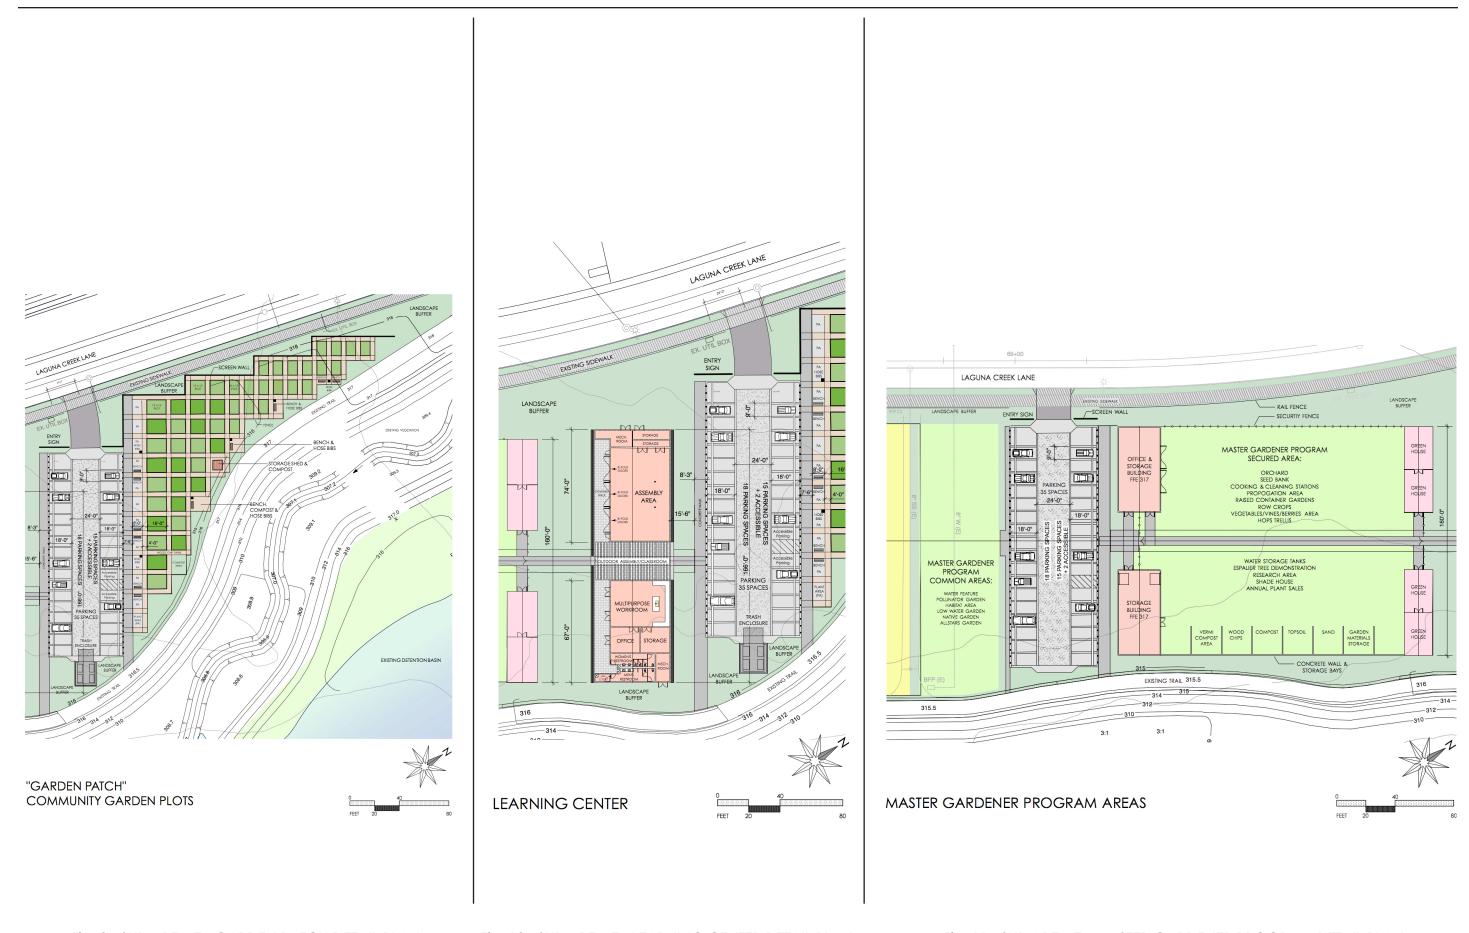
SUB-AREA 7 - GARDEN PATCH DETAIL PLAN
